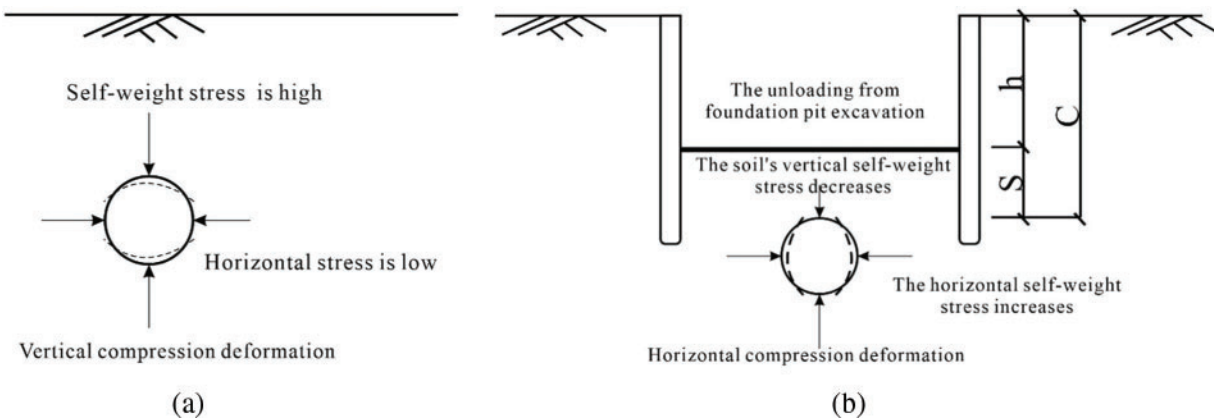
Deformation of the tunnel cross-section induced by foundation pit excavation. (a) Initial convergence state of the tunnel; (b) Tunnel convergence variation after foundation pit excavation
